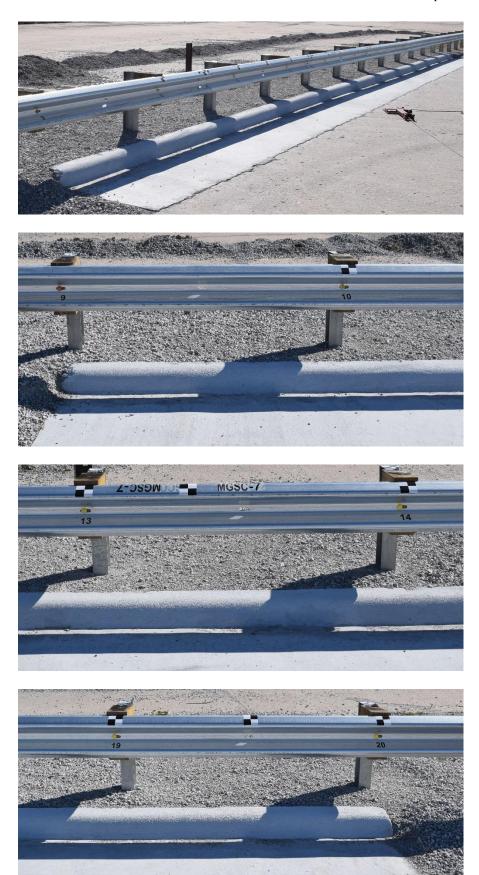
Test Installation Photographs, Test No. MGSC-7 20
